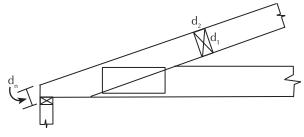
Depth for Shear Check of Scarf Cut Bearing.
